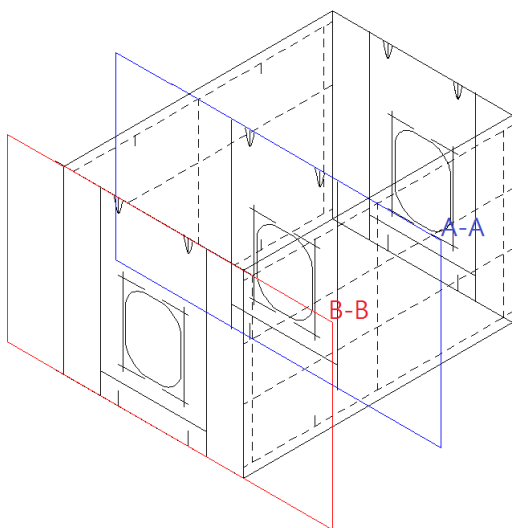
Model Steel Box Girder Girder Three-dimensional view
